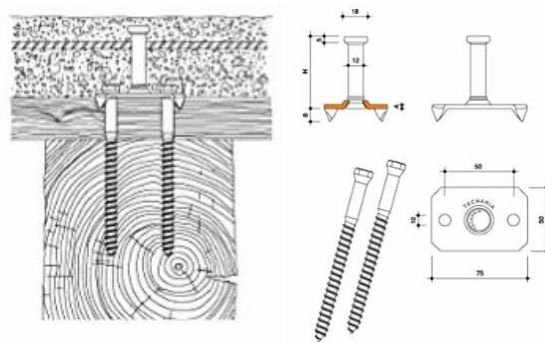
Tecnaria system (a) Cross sectional cut (b) detail drawings of the Tecnaria fastener [8, p. 13]
